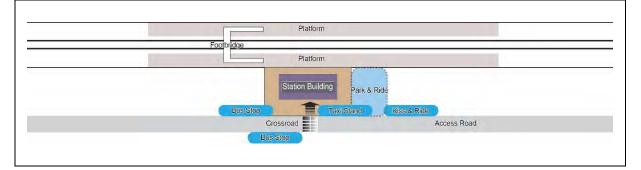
Prototype Site Plan of At Grade Type Small Station
